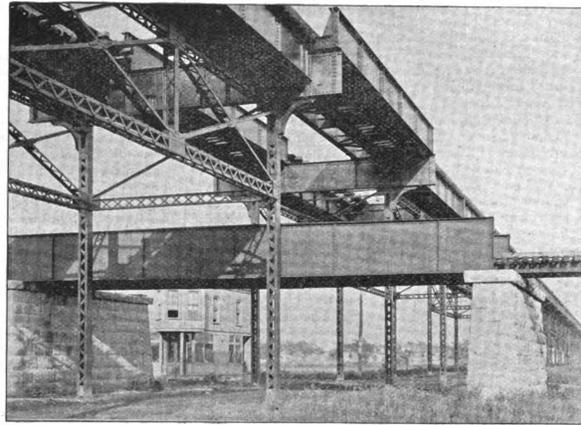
Crossing of Lake Street Elevated Railroad and Belt Railway of Chicago on West Lake Street.
